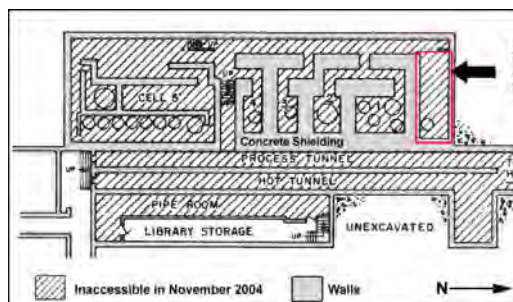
Building G2, Basement, 325-Foot Level, Pump Room
